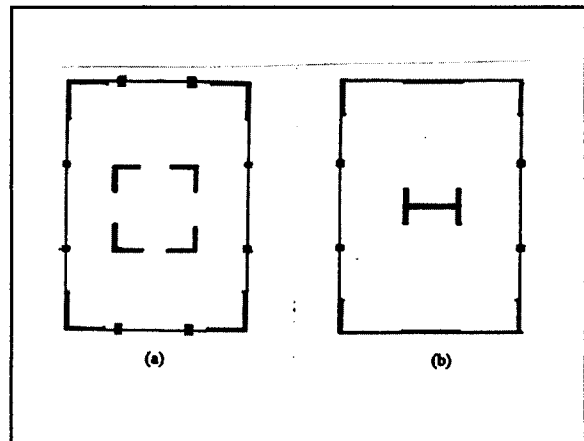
Arrangement of shear walls and braced frames – recommended. Note that the heavy lines indicate shear walls and/or braced frames.
